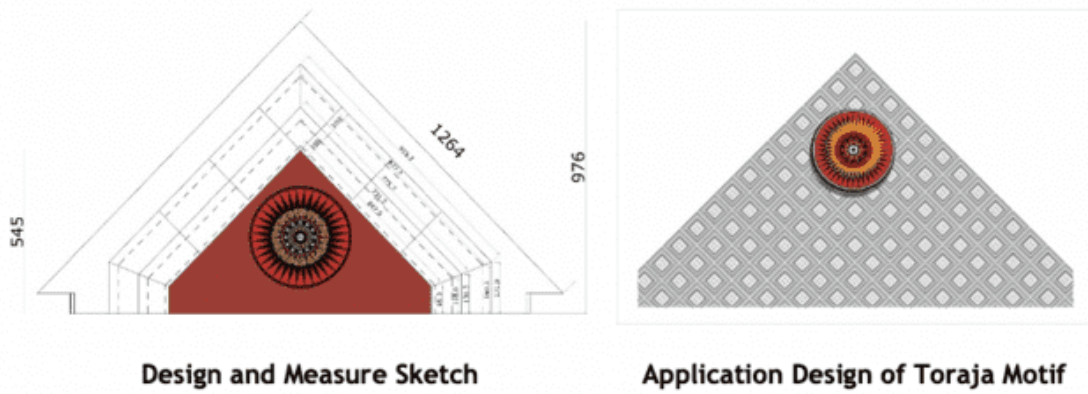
Relief Design of Aesthetic Elements for Building Façade
